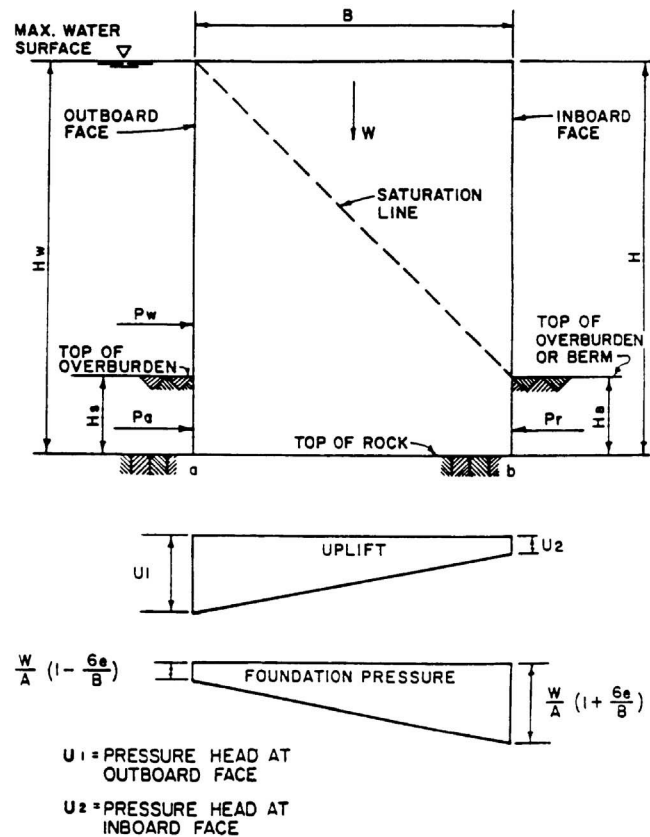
Overturning Stability, Typical Loading and Nomenclature
